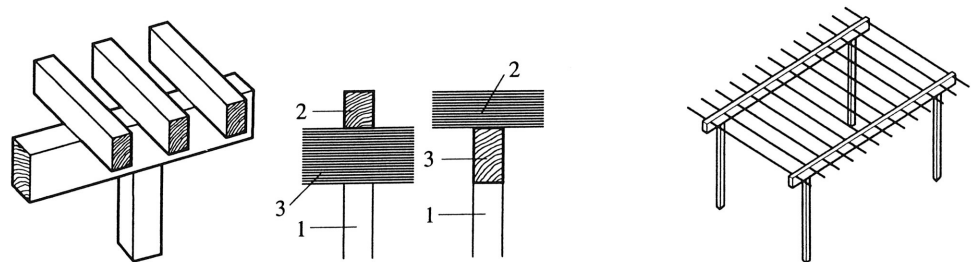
Single section main supporting beam and single section column, single-storey. (1) Column, (2) secondary beam, (3) main beam.
